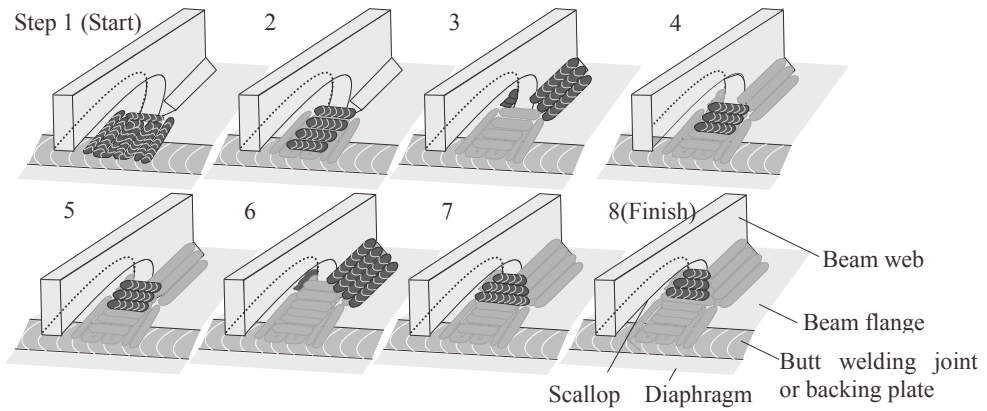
Welding pass sequence of the overlay welding method around toes of scallops
